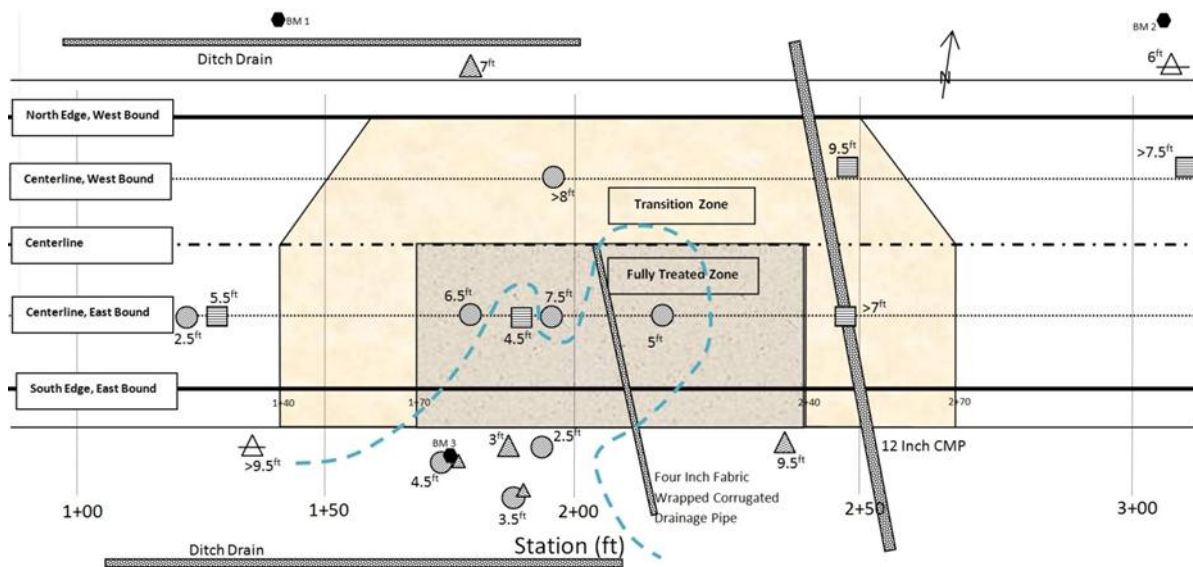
Sketch. Plan View Showing Depth to Bedrock and Proposed Outline of Caprock.
